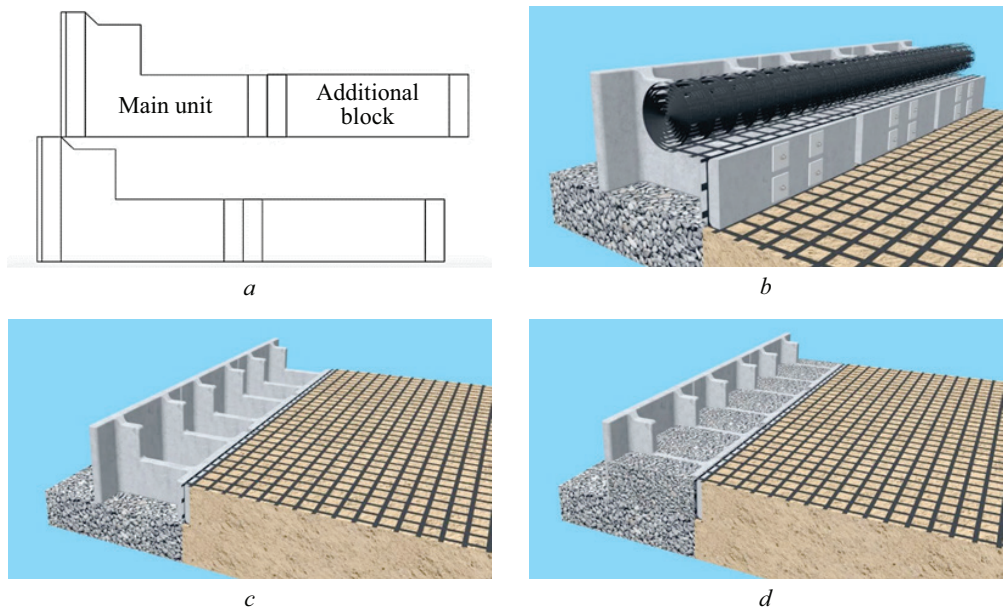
Schemes of new technical solutions of retaining wall elements made of soil-filled blocks: *a* — with additional block; *b, c, d* — in combination with reinforced soil (stages of construction)
